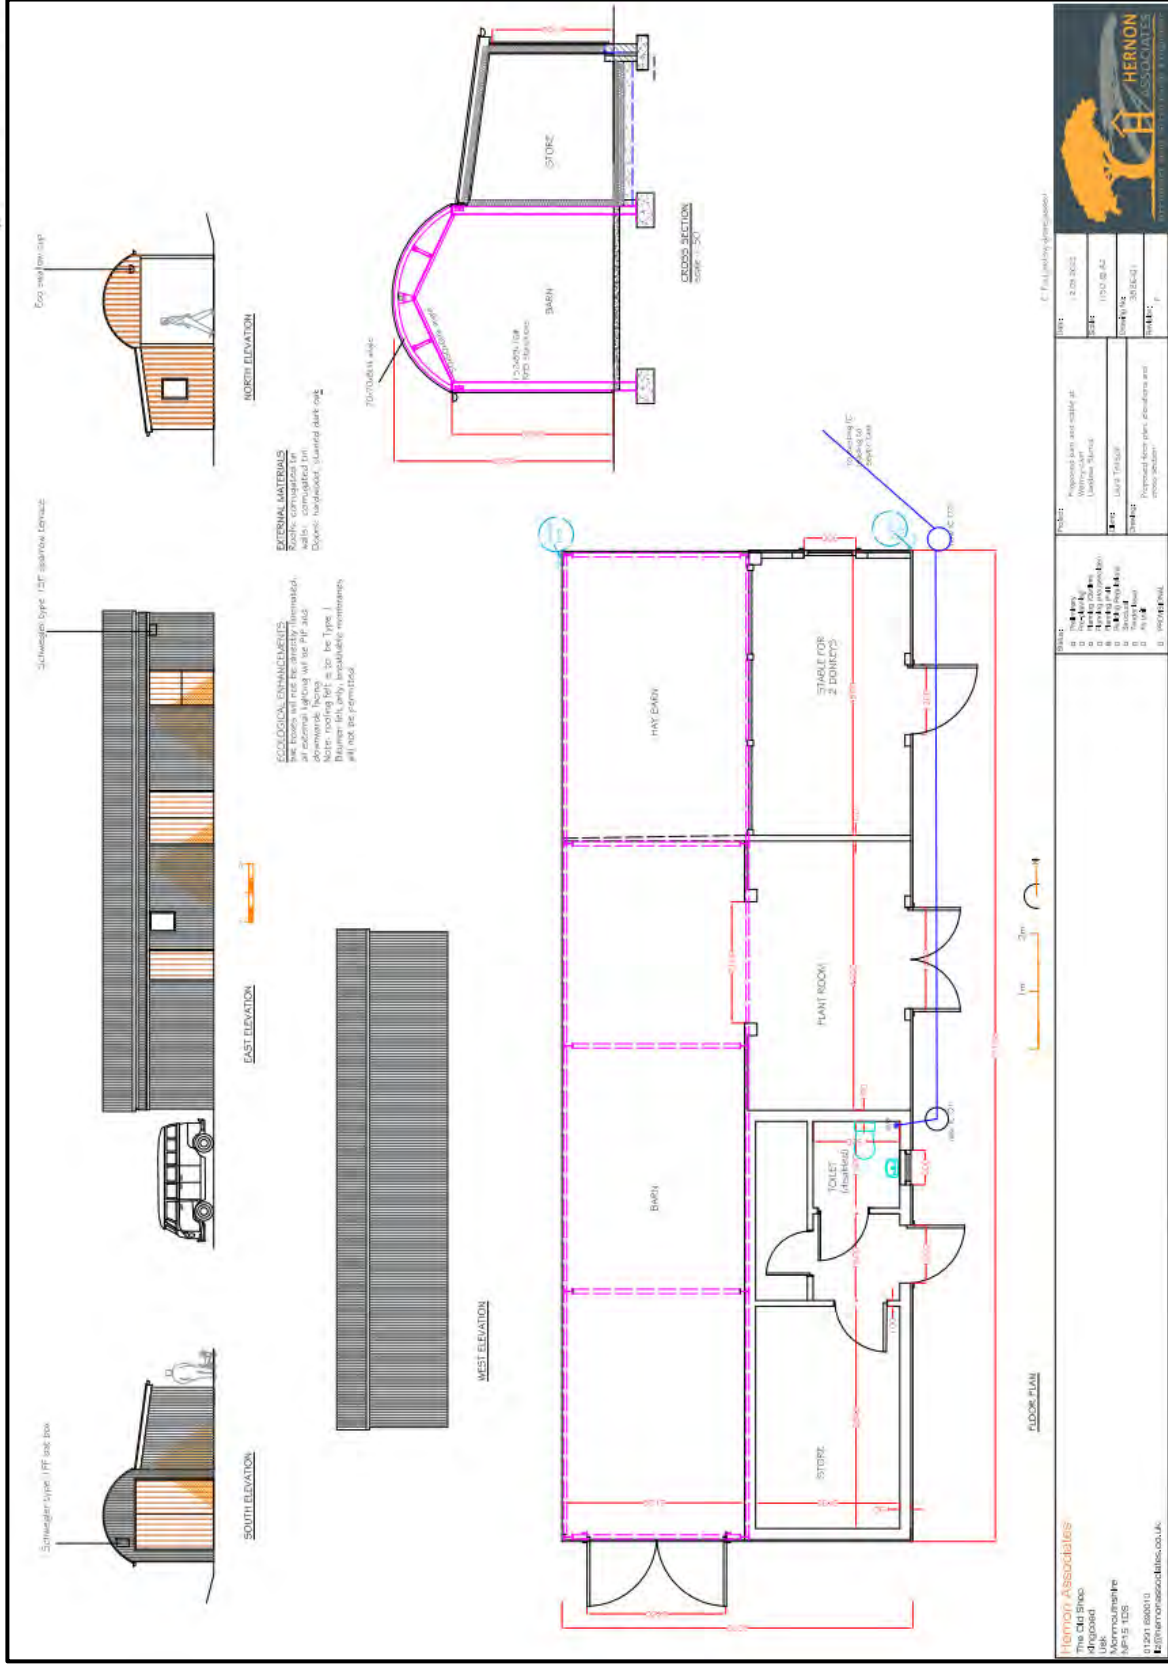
Proposed Floor Plan, Elevations and Cross Sections for Barn and Stable (Courtesy of Hernon Associates)
